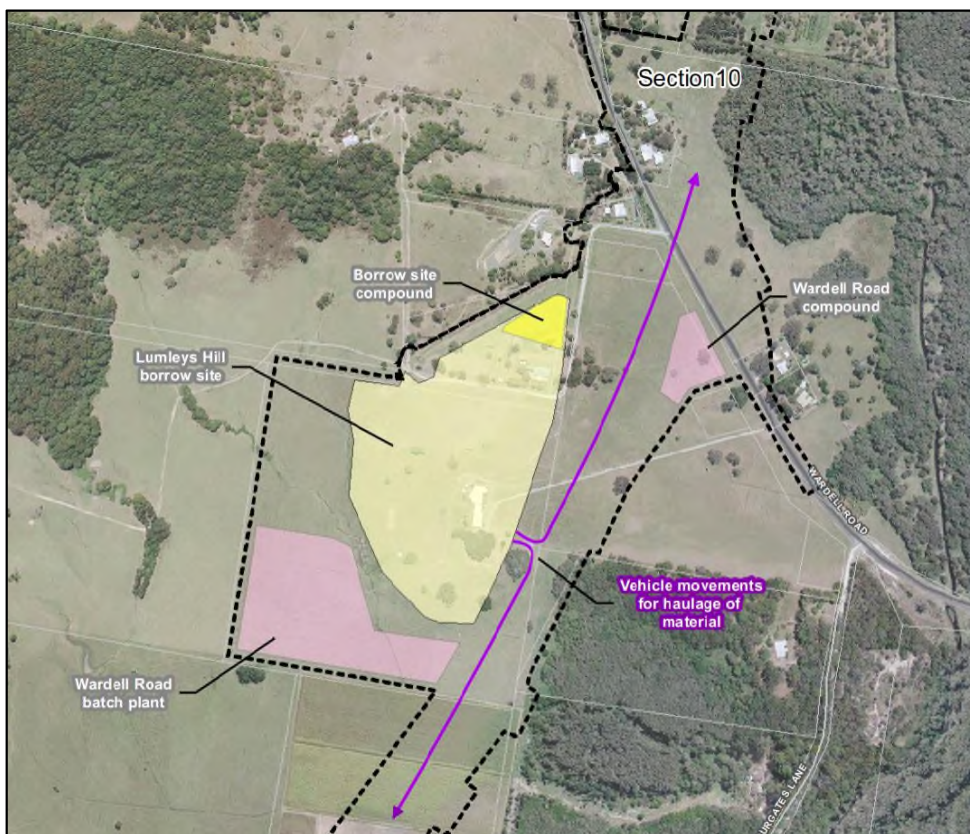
The proposed site at Lumleys Hill for the site compound, batch plant and borrow site.
